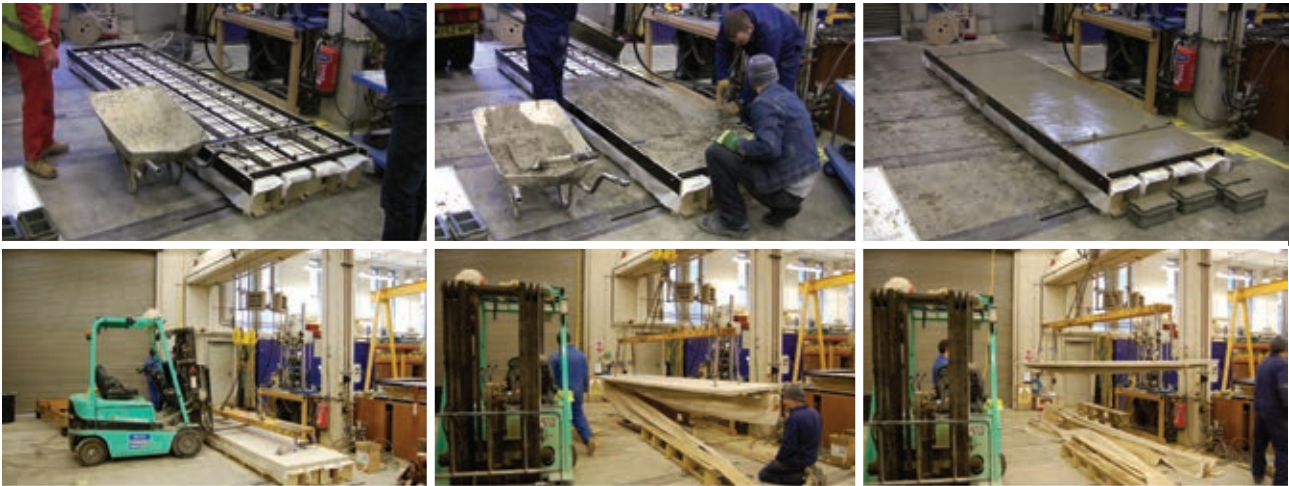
Casting and demoulding of Beam 6\_4\_1.
